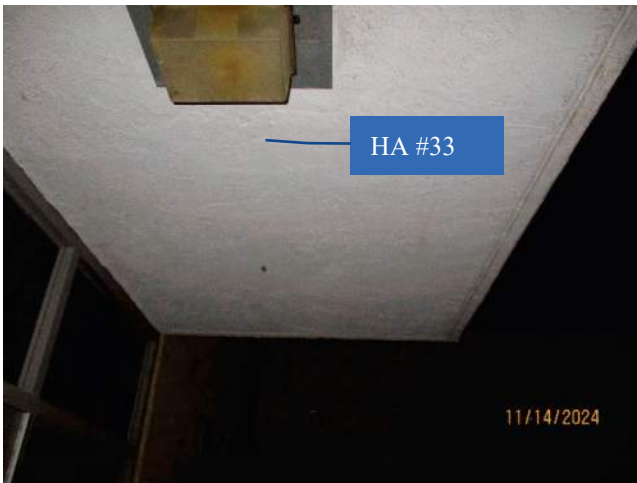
View of HA #33: Non-ACBM exterior concrete canopy.
